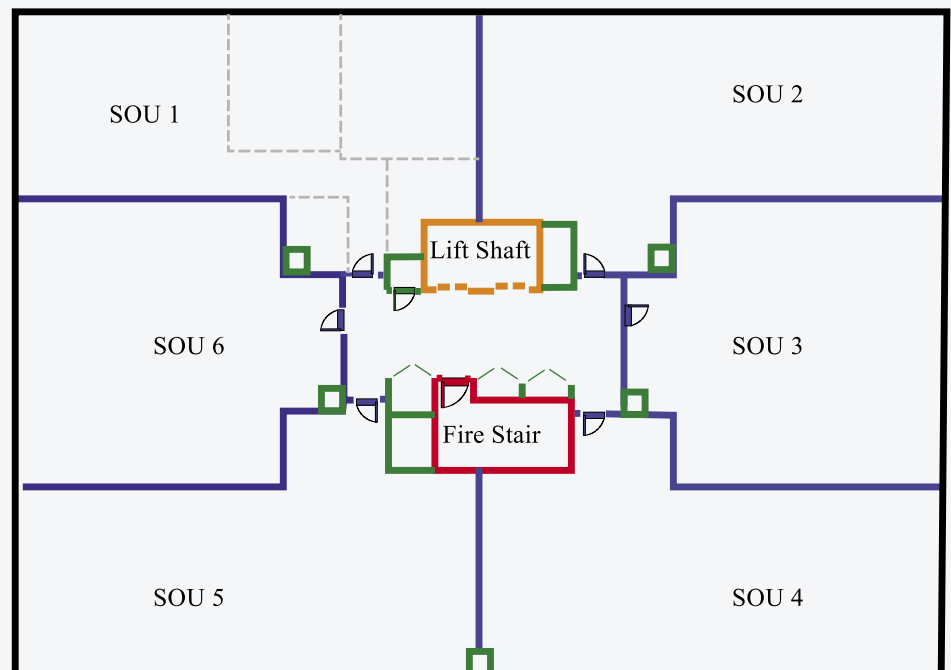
Schematic plan of a residential level of a generic Class 2/3 building.
